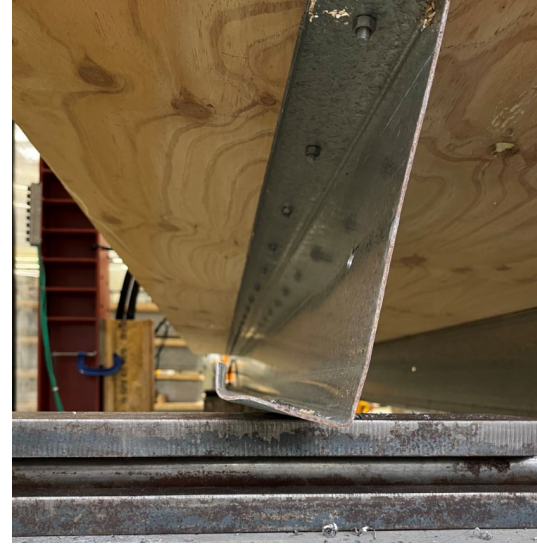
Bottom flange rotation and bending near the supports (Specimen SP-10)
